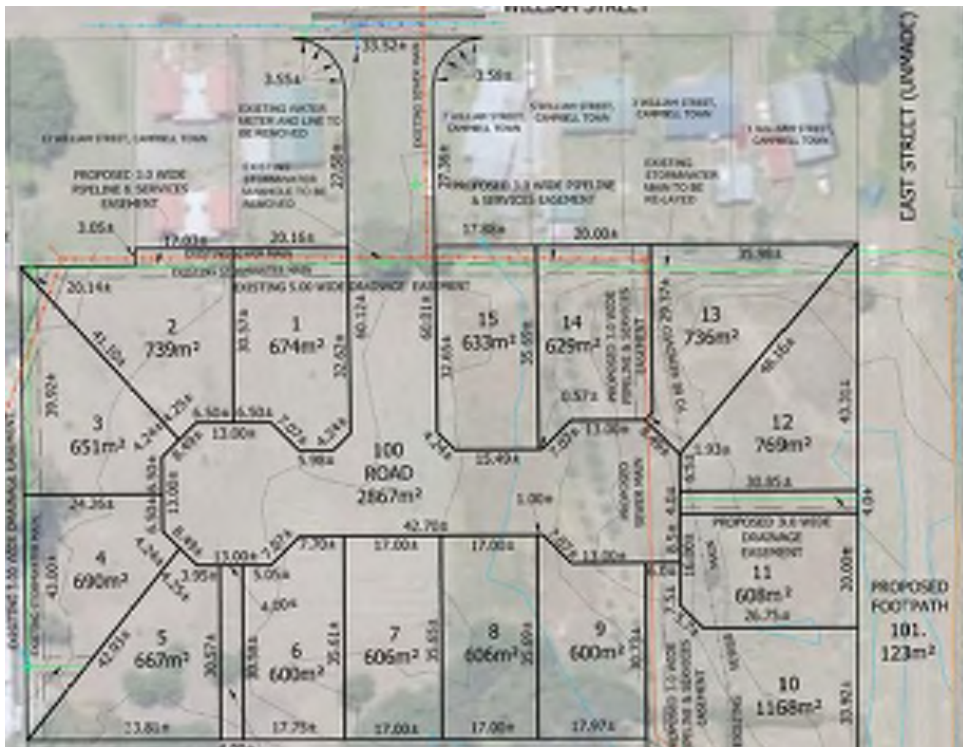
Proposed subdivision layout. Refer to Annexure 2 for detail.
